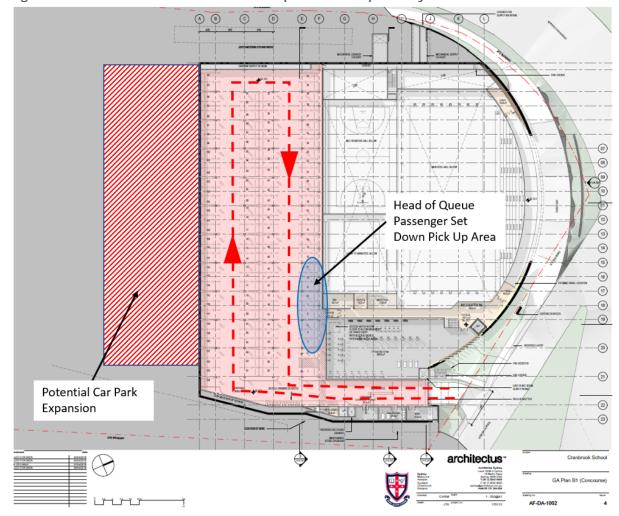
Alternate Solution for On Site Drop Off - Pick Up Facility
